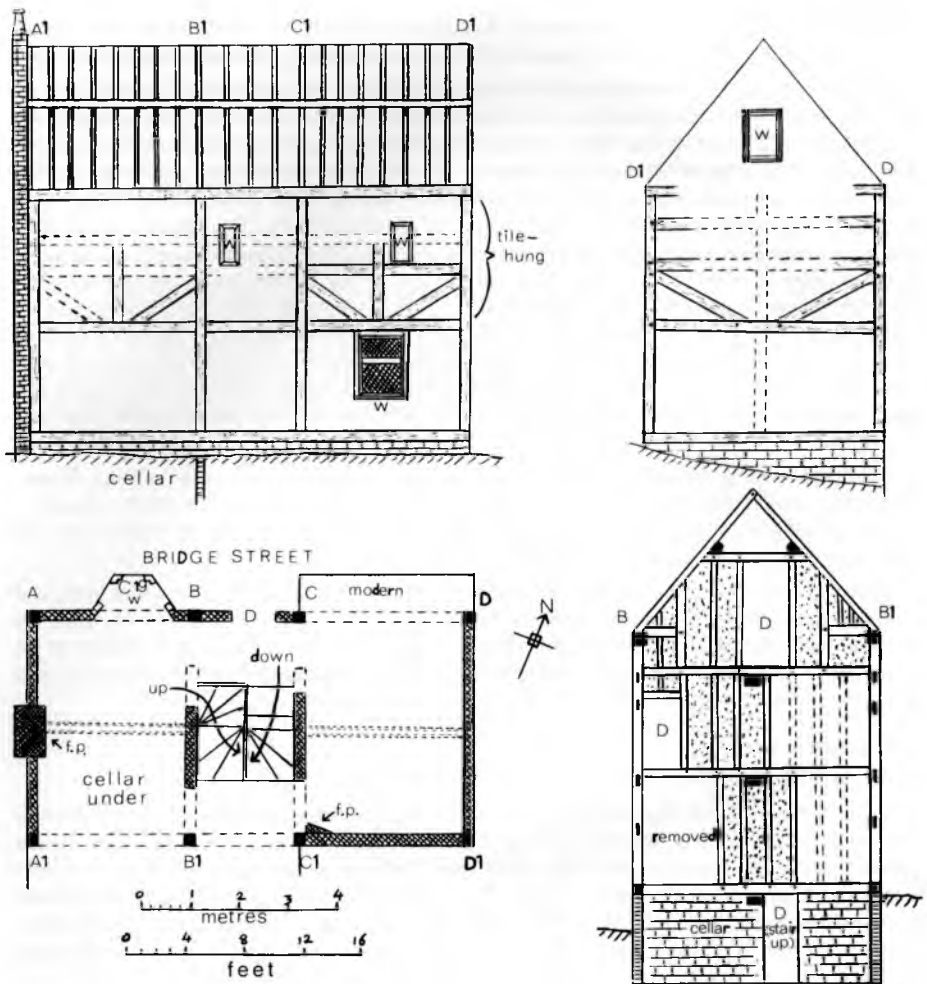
25/7 BRIDGE STREET: SURVEY MADE IN 1972.
